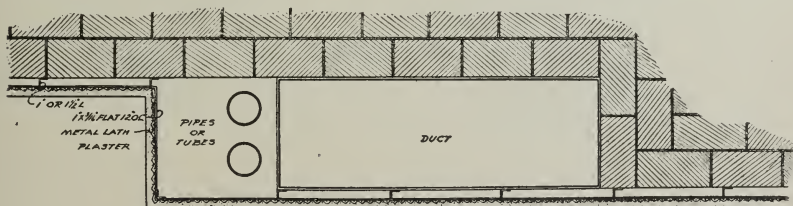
White System of Furring Walls, Pipes and Ducts.
